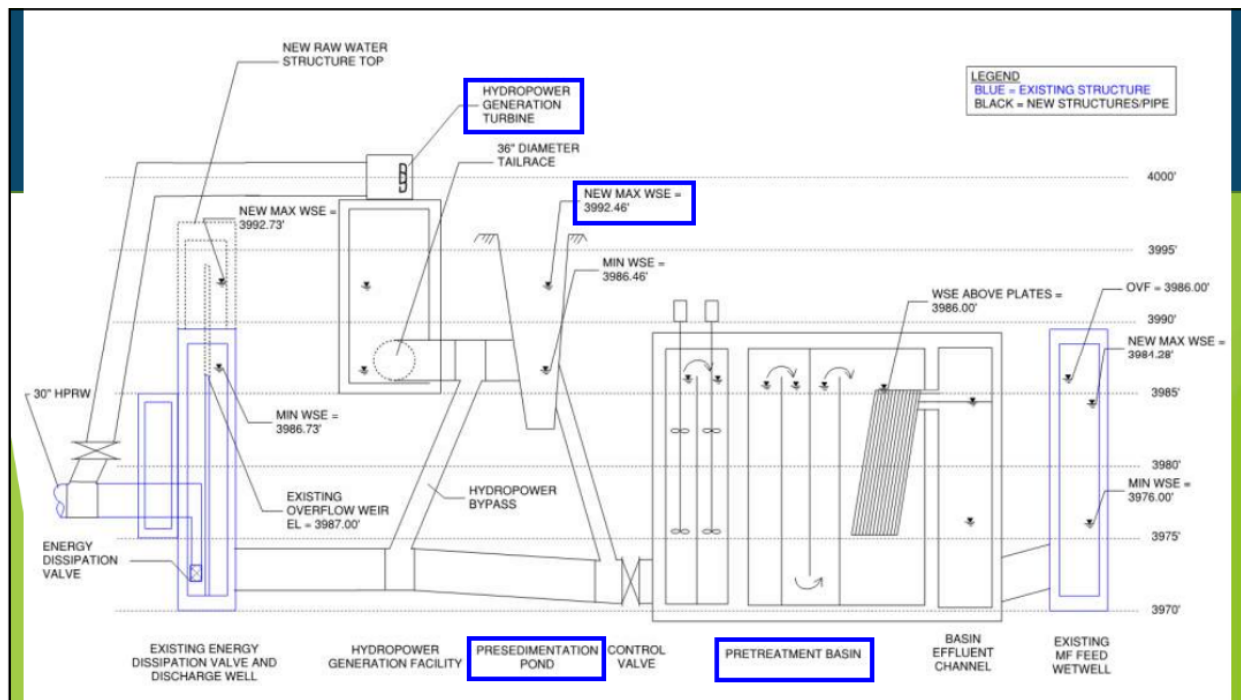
Key Elevations Along the Proposed Outback Site Development with Key Locations Highlighted
